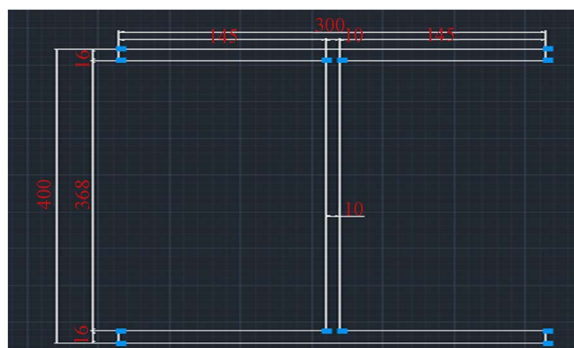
Schematic diagram of cross-section dimensions of I-shaped steel beams
